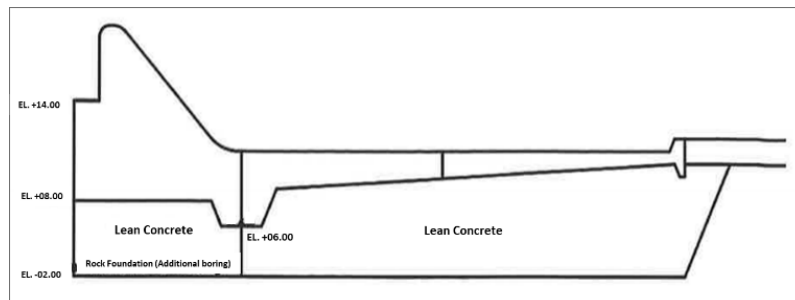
Lean concrete foundation design suggested by the Dam Advisory Service (DAS) Team
